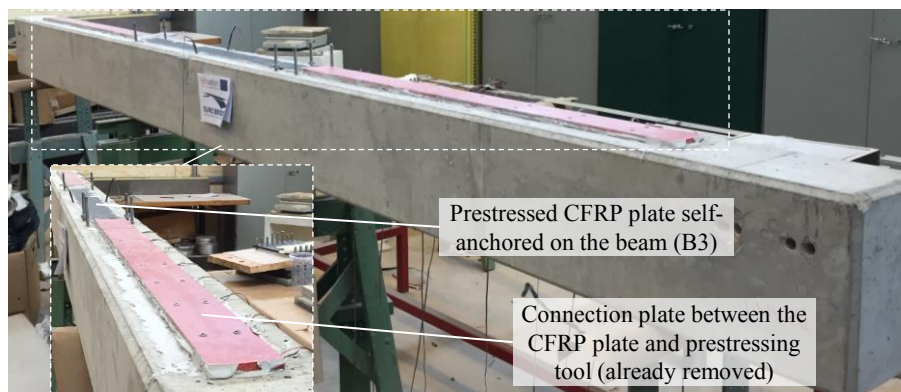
Self-anchored prestressed CFRP plate on the concrete beam (specimen B3) after removal of the prestressing system.
